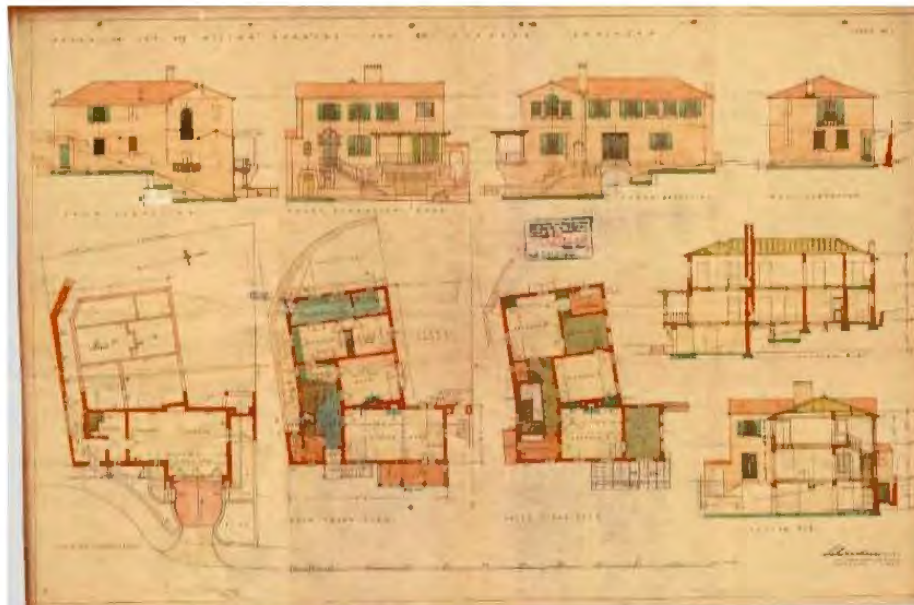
Architectural plans submitted with BA99/1932 (Source: Woollahra Records)
